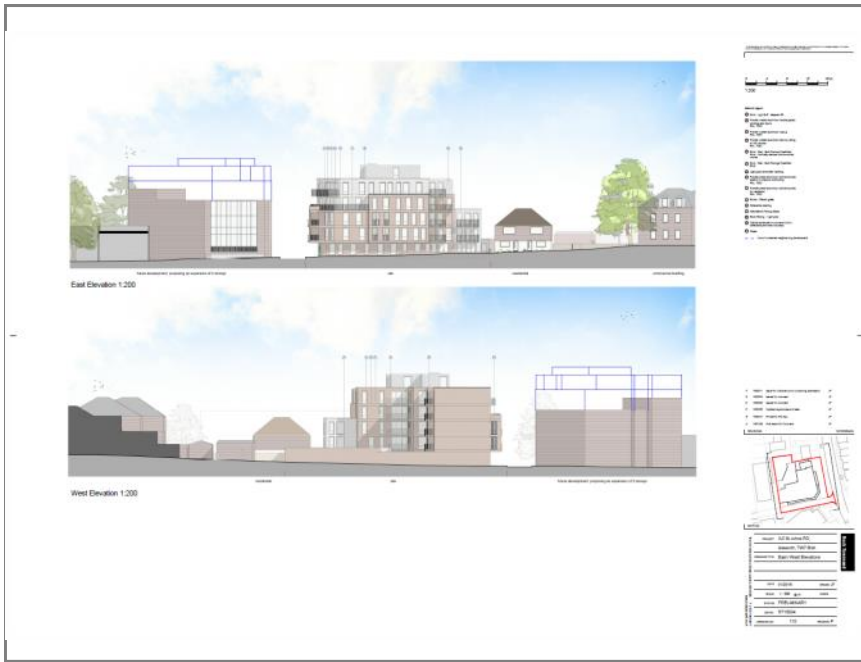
Proposed eastern and western elevations. Source: Rock Townsend 2016).
